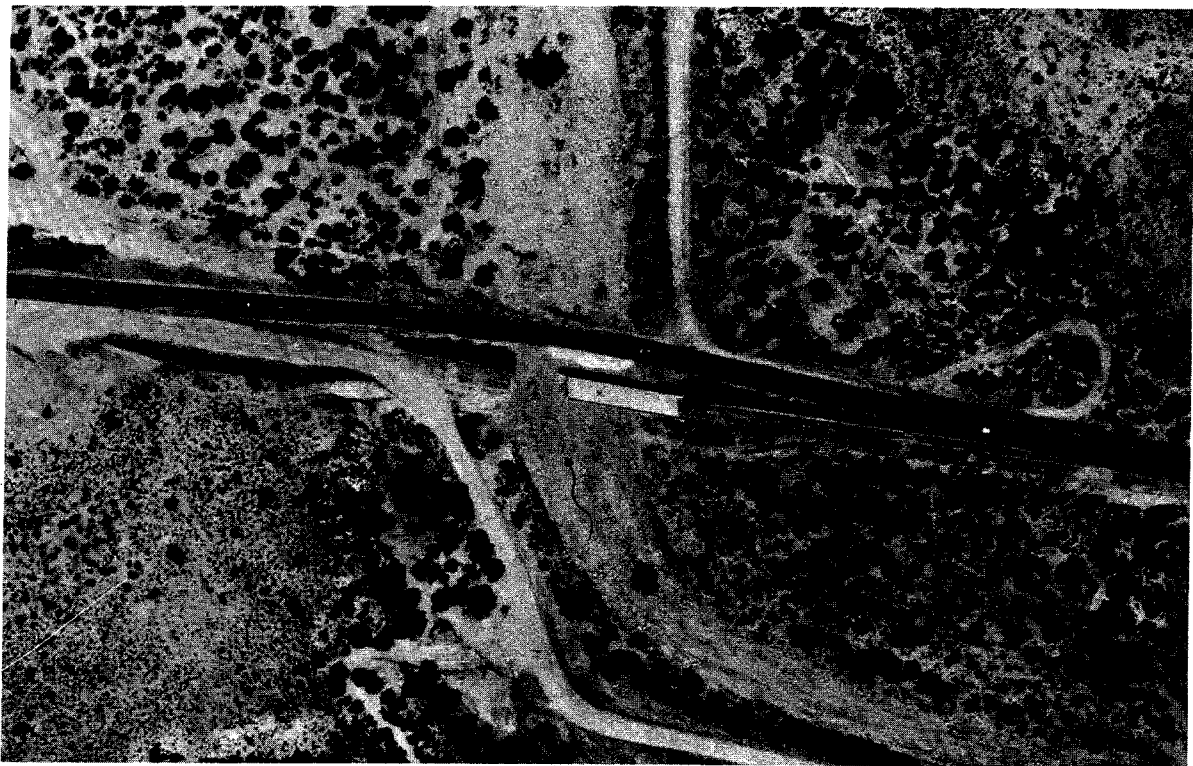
Aerial view in 1971 of bridge damaged by flood of September 1970. (From Arizona Dept. of Highways.)
